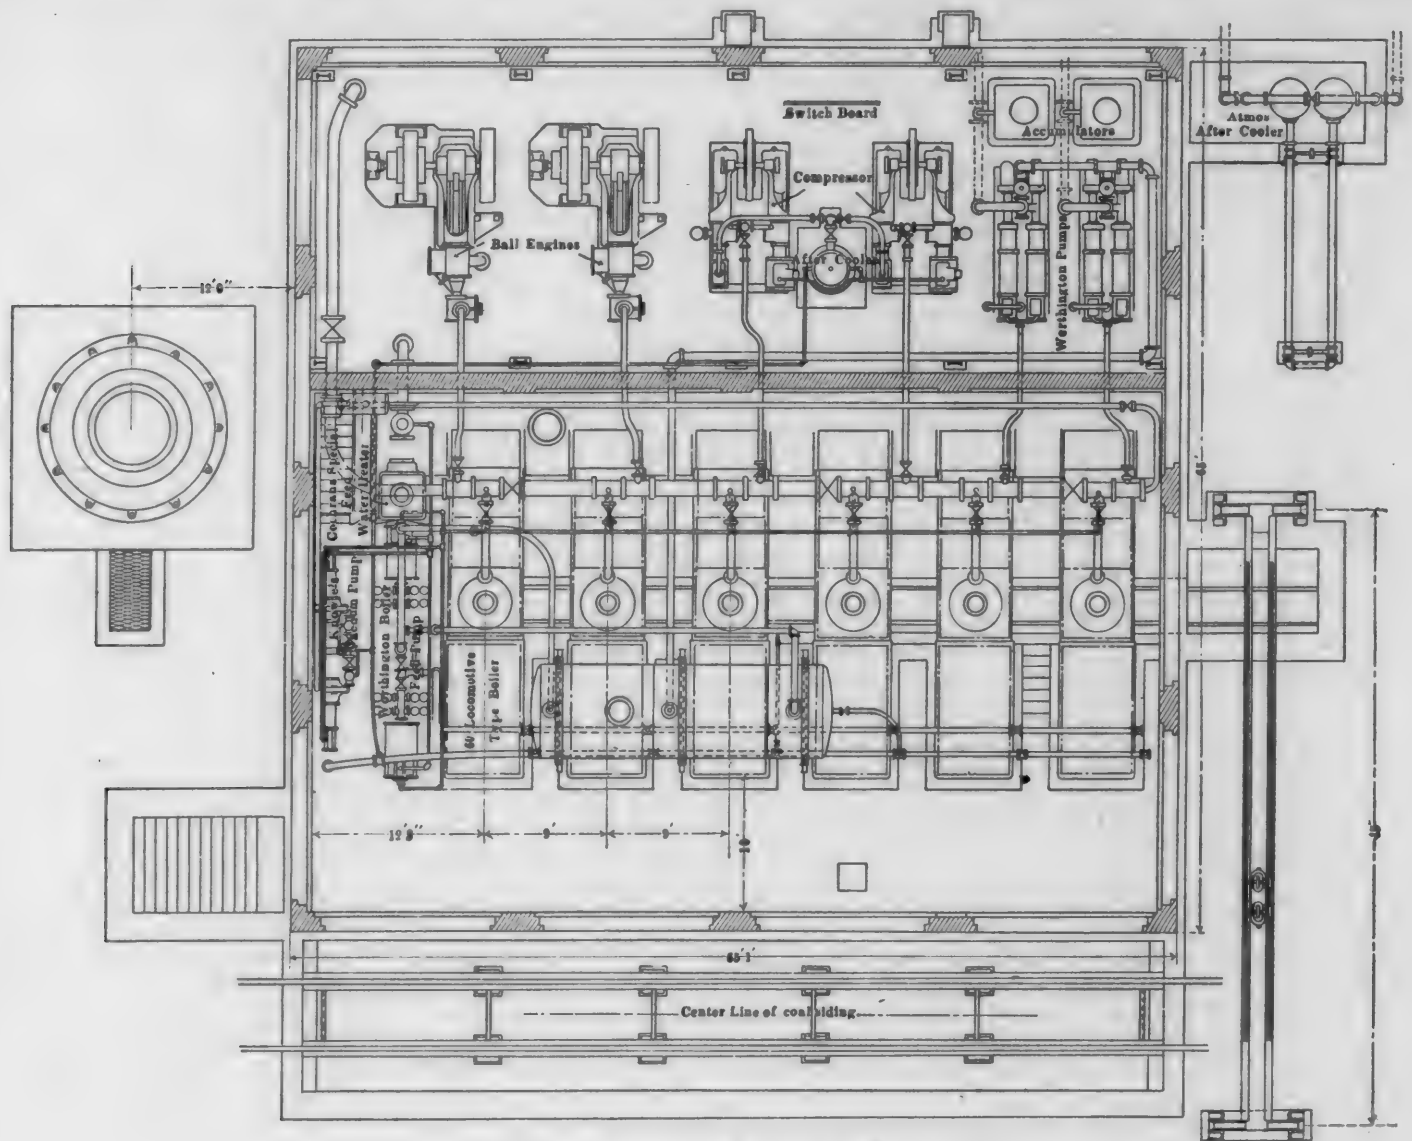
PLAN VIEW OF POWER HOUSE.
